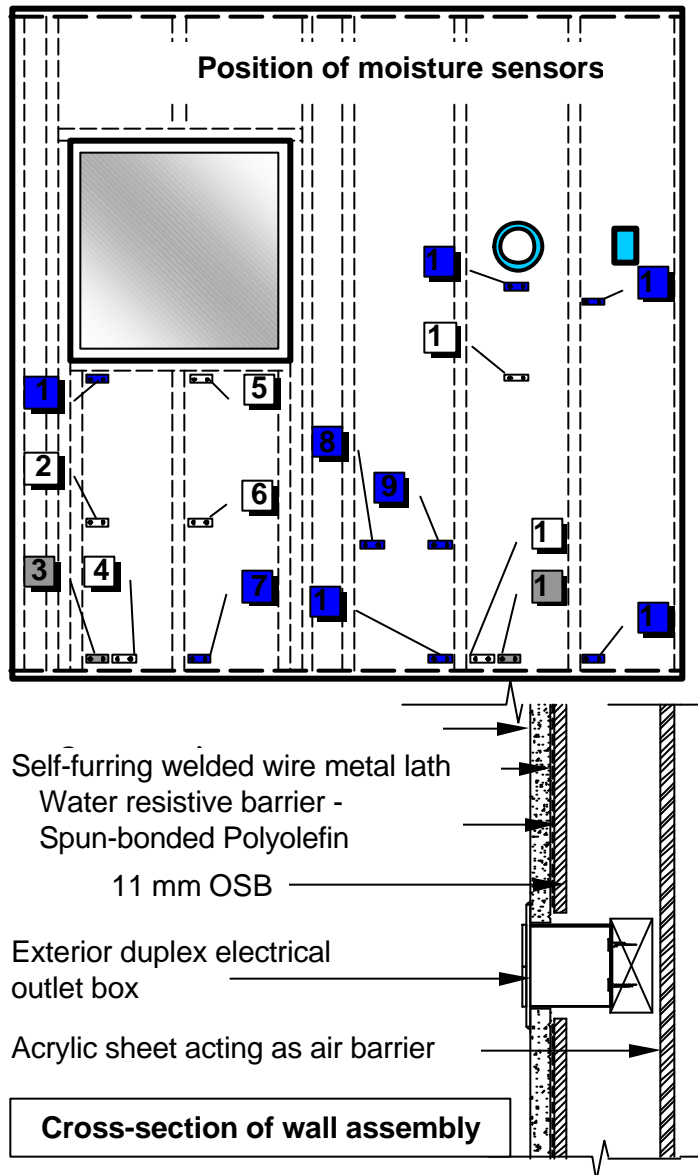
Stage 2 Water Penetration of WA-3 - Static test on Stucco-clad walls
